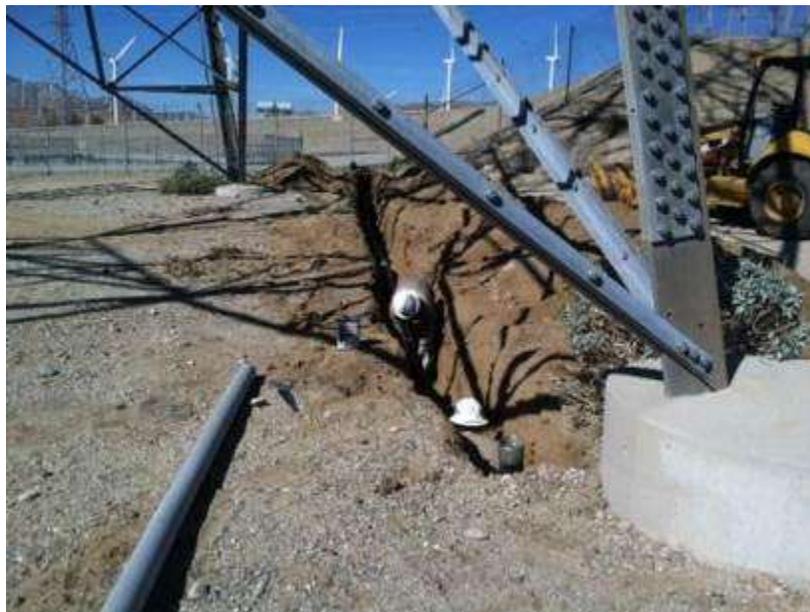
Telecommunications conduit trench work from the Devers Substation to Tower 1000X.
